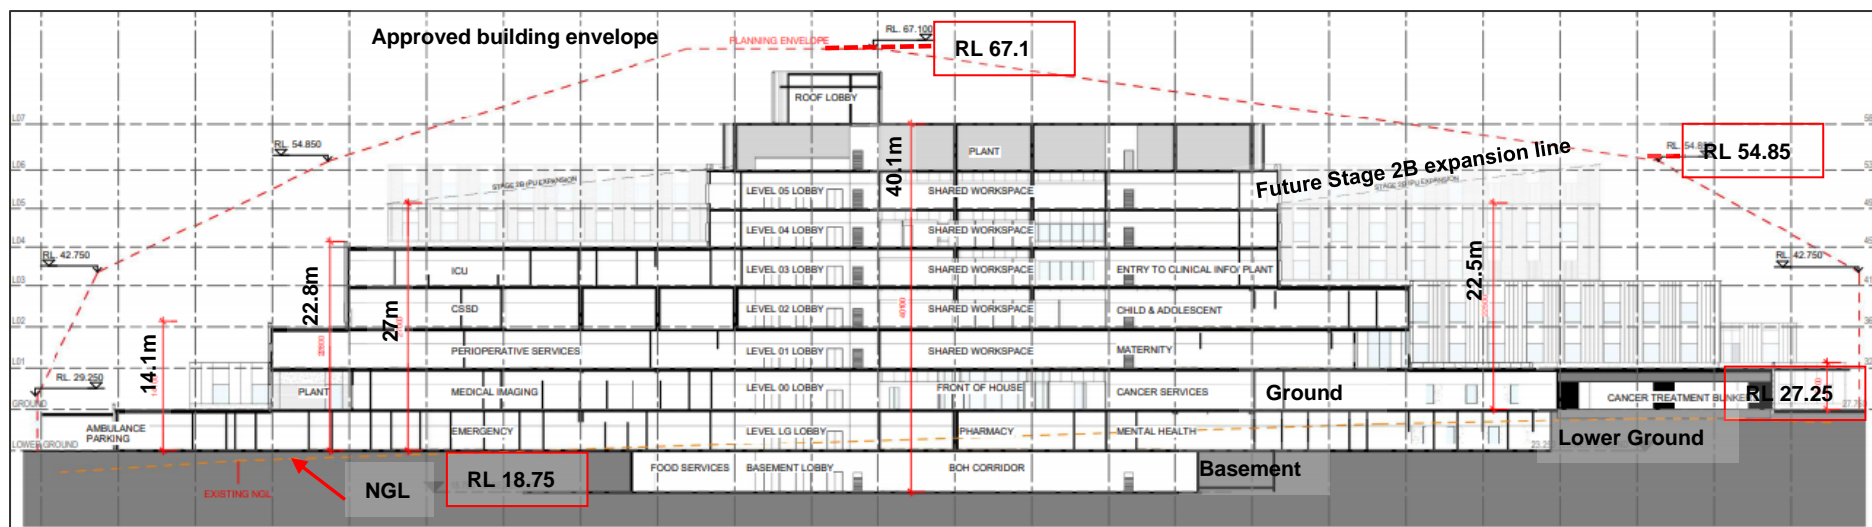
| East-West Section through the new hospital building identifying the lobby / emergency / staff areas / plant room (Source: Applicant's RTS)
